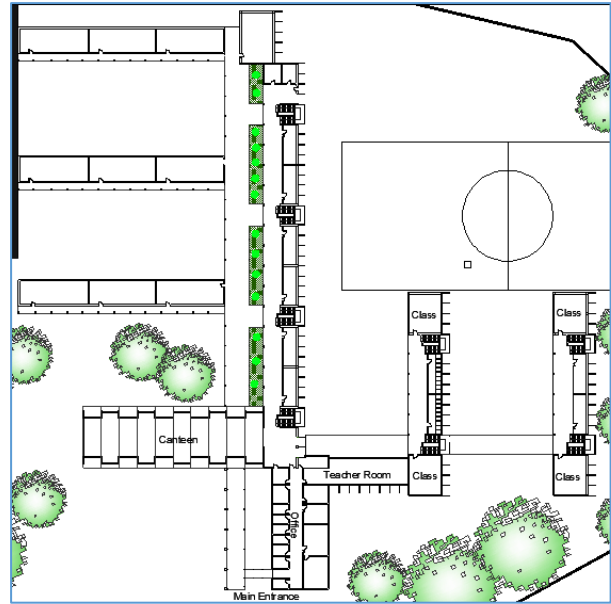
The Ground Floor Plan for Lefkoşa türk lisesi (Drawn by Author).
